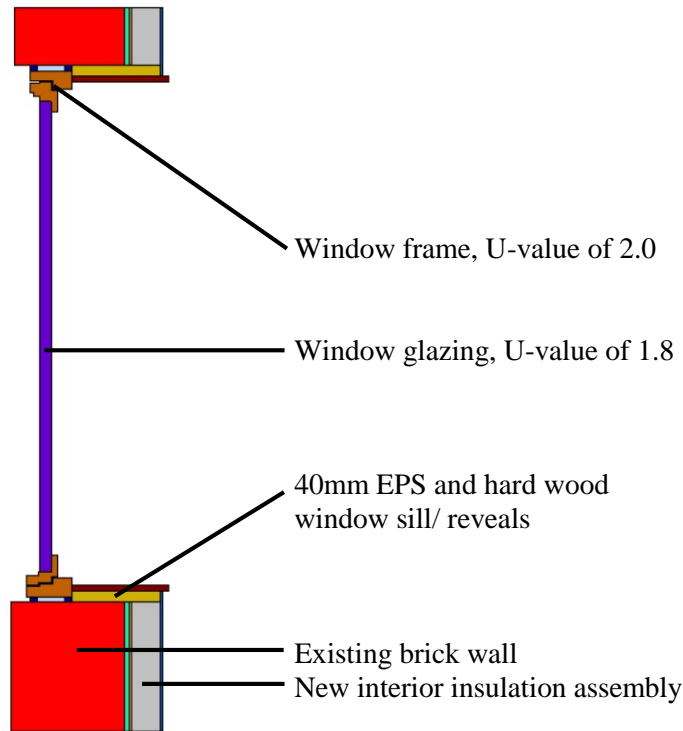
Window-wall junction, wall assembly H (Illustration by the author)
